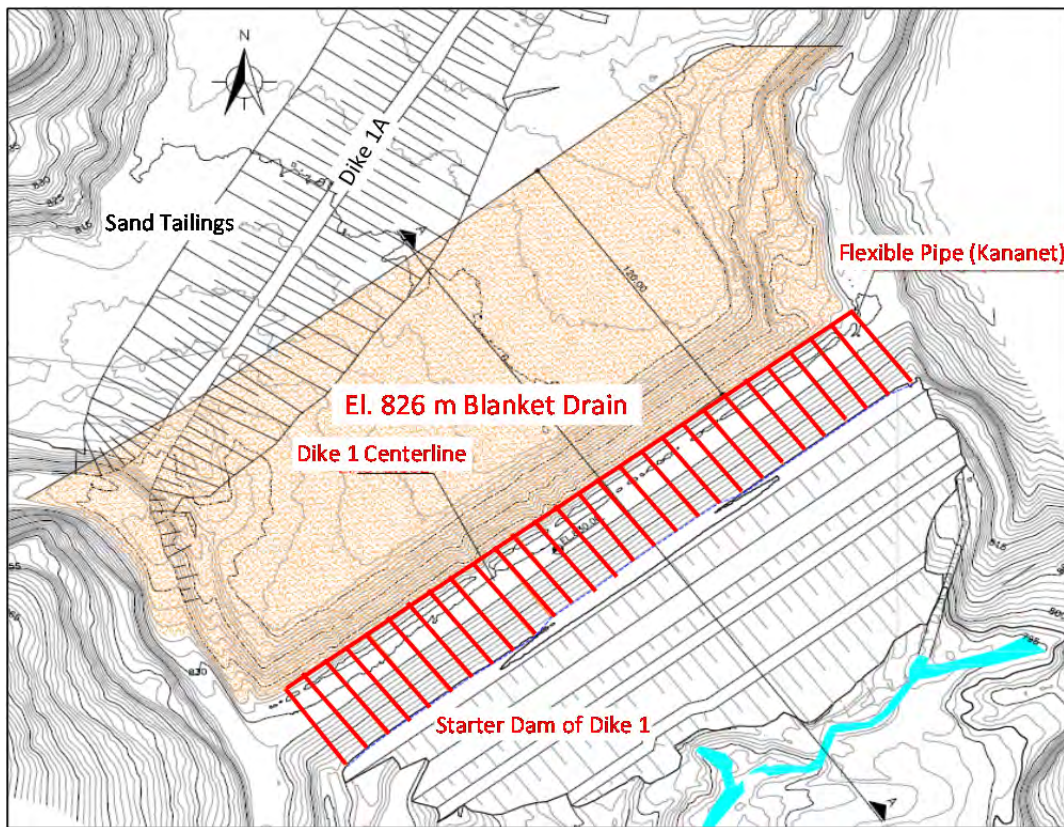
Blanket drain (plan view) on tailings surface at El. 826 m
